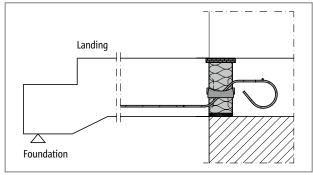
Schöck Isokorb® T type Q: Connection stair flight with thermal insulating cavity masonry (e.g. T type Q-V1 to T Typ Q-V5)
